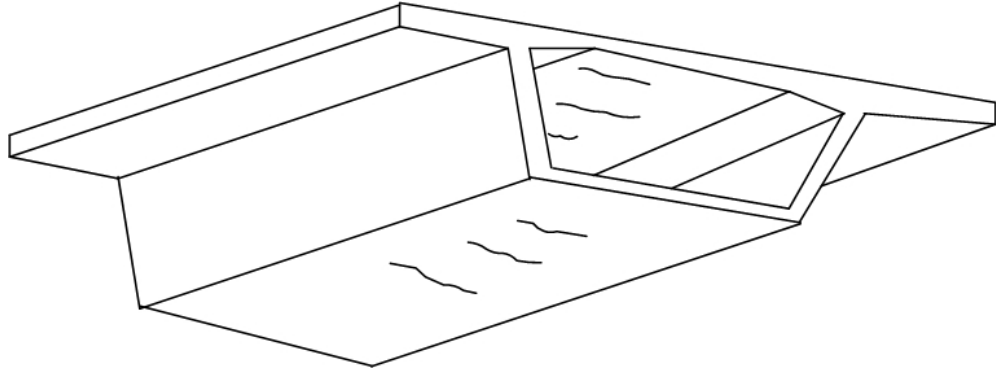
Thermally Induced Transverse Cracks in Box Girder Flanges
